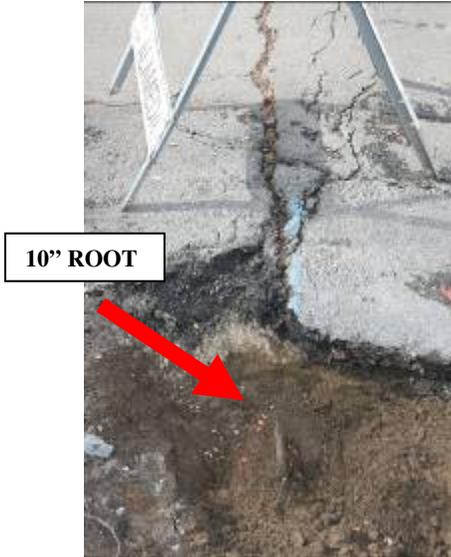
Photo above shows the uplifted street that extends well out to the center of the roadway. Only cutting the root will solve the problem.
